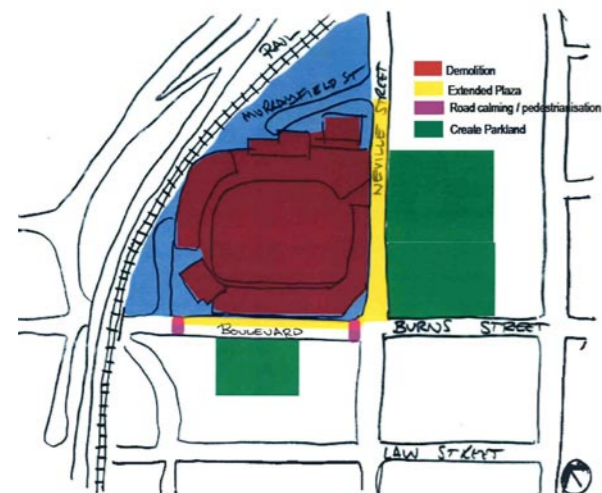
Site Plan - Demolition and Pedestrianisation
